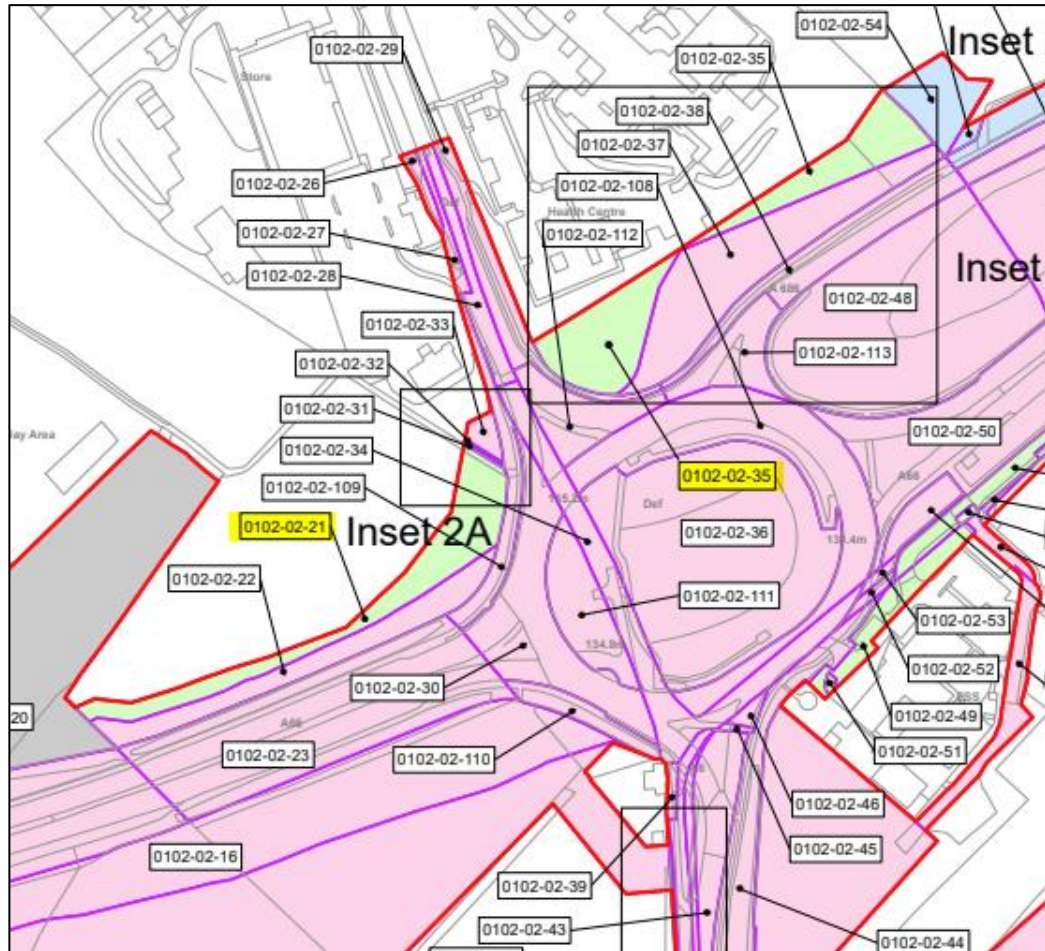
(g) – Land Plan excerpt showing the land (shaded green) originally proposed to be required temporarily
